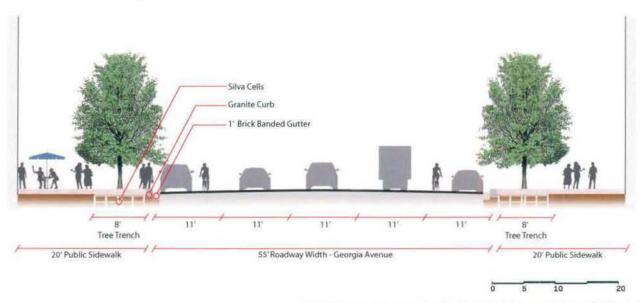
Typical Cross Section of Georgia Avenue at Howard University
